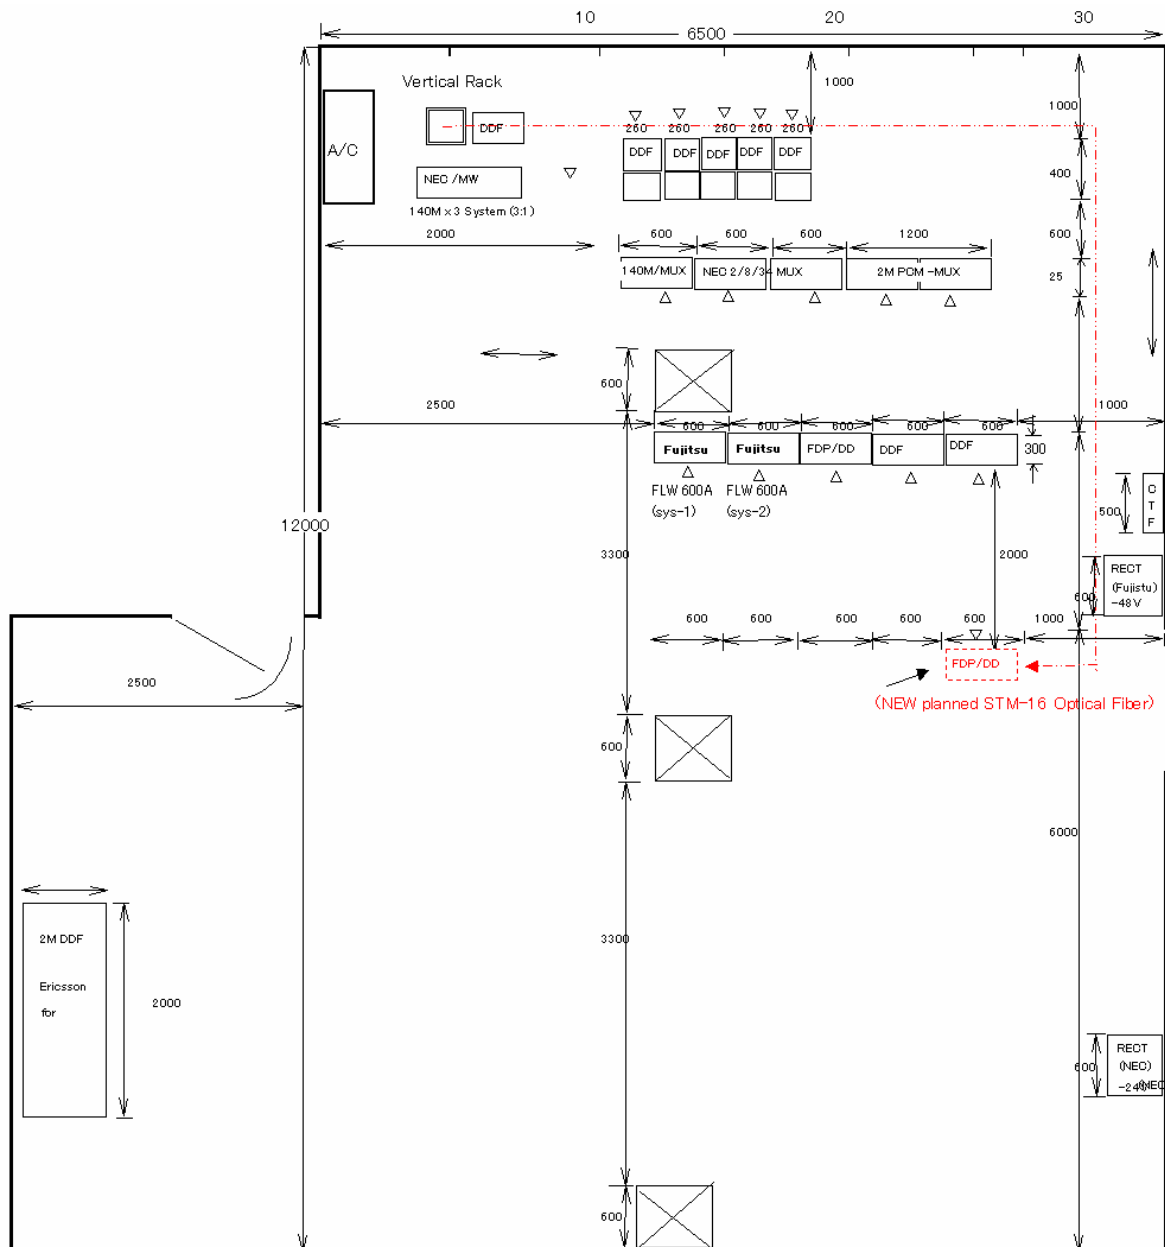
RADIO/MUX ROOM Planned Installation Place (FILWOHA Center)
